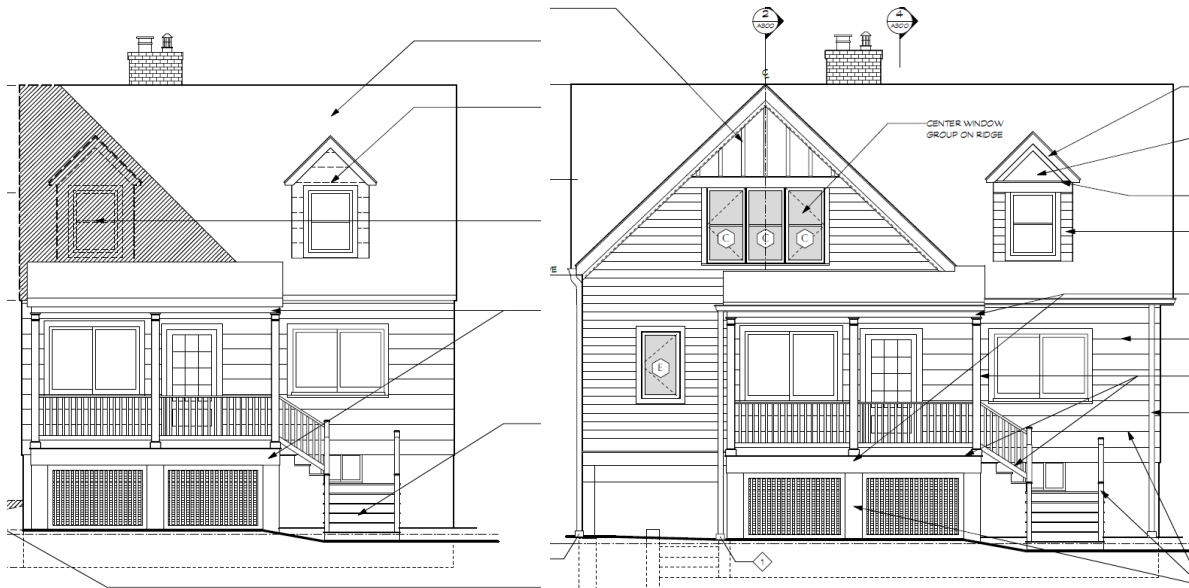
Existing front elevation (left) and proposed front elevation (right).
